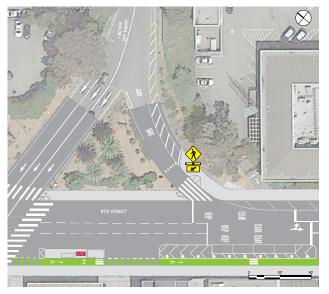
8th Street between Bryant and Harrison streets Improvement Plan
